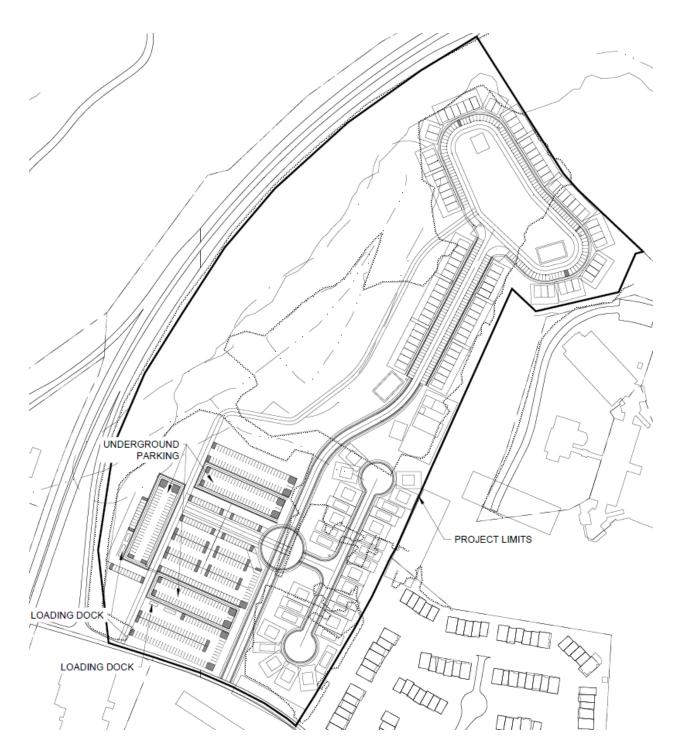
Preliminary Site Plan 100% (December 06, 2023)
